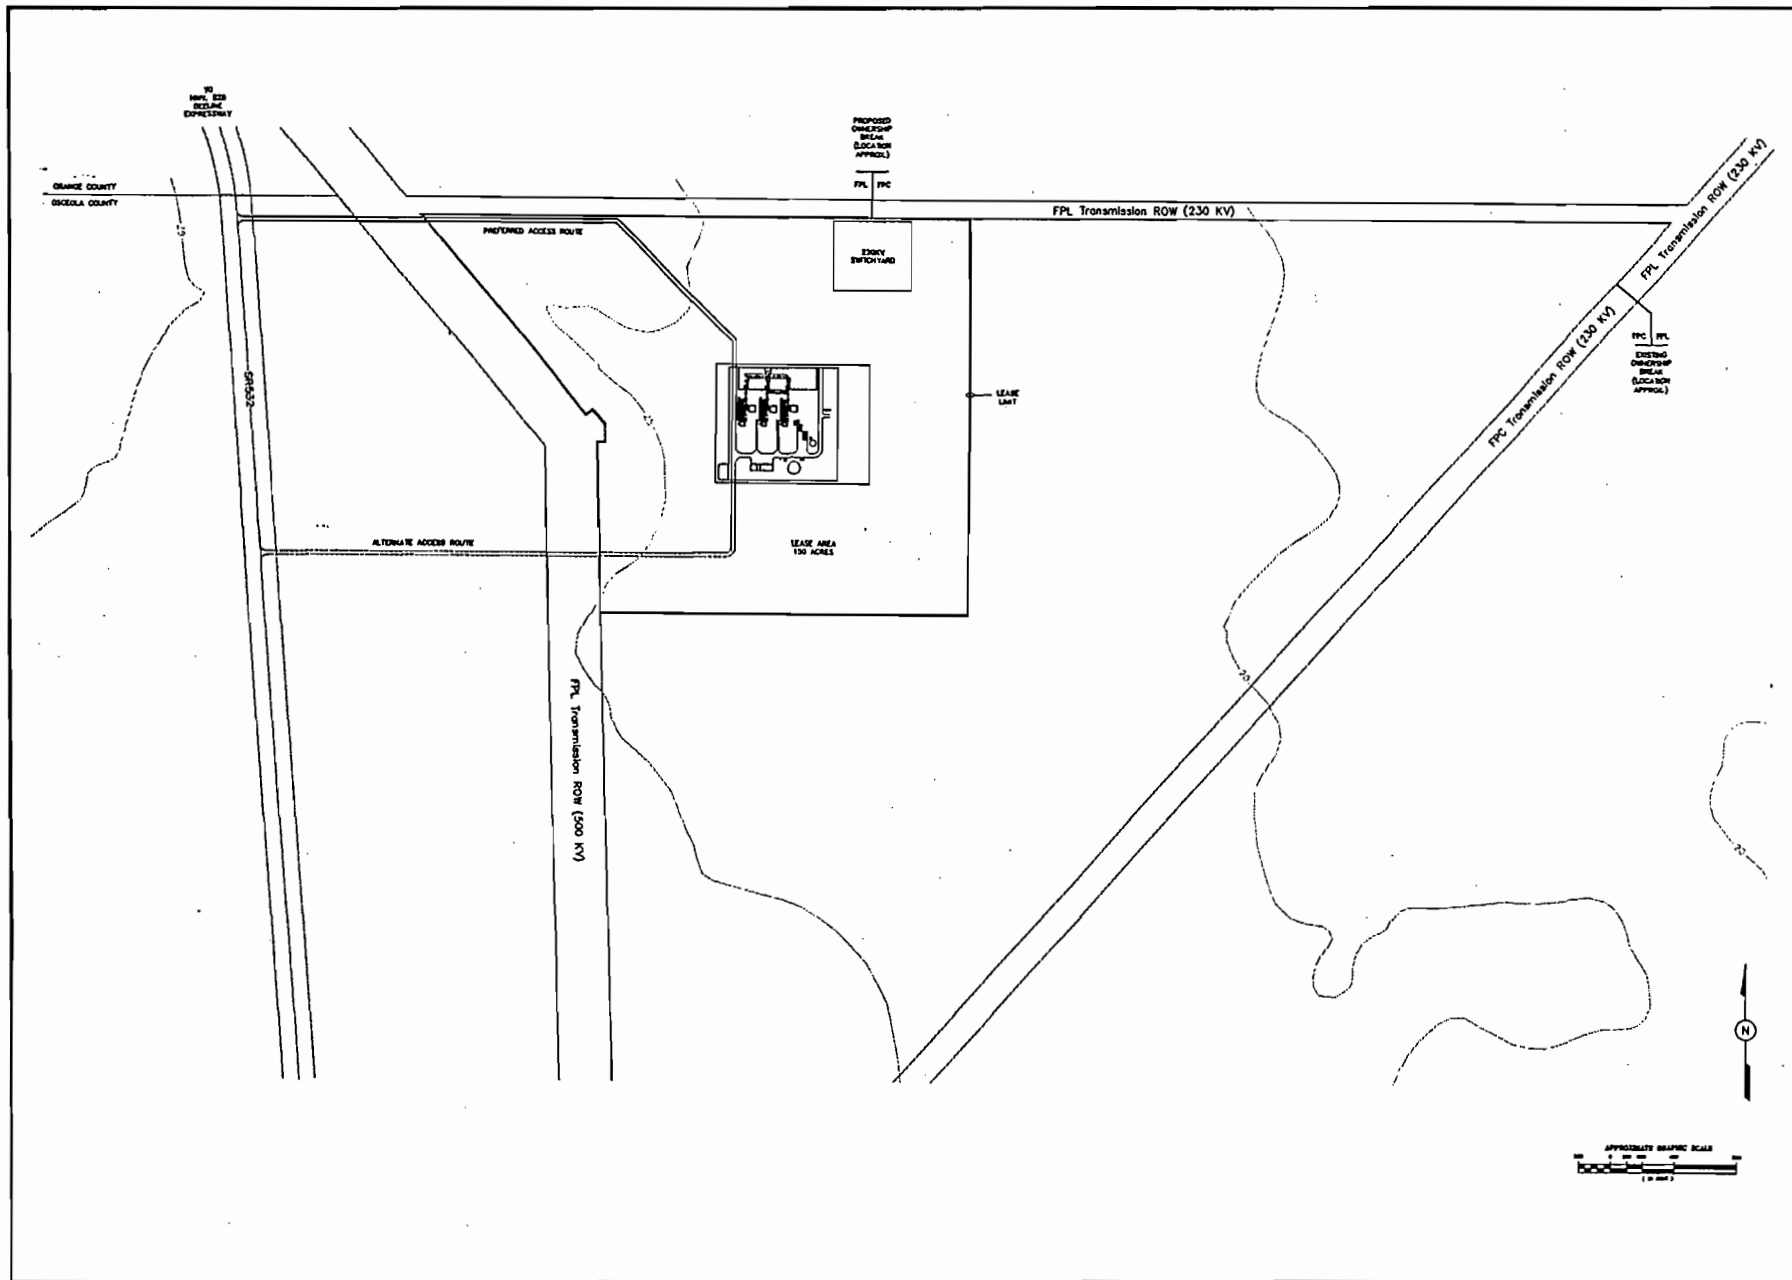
Site Location Plan of Proposed Palmetto Power LLC Facility
